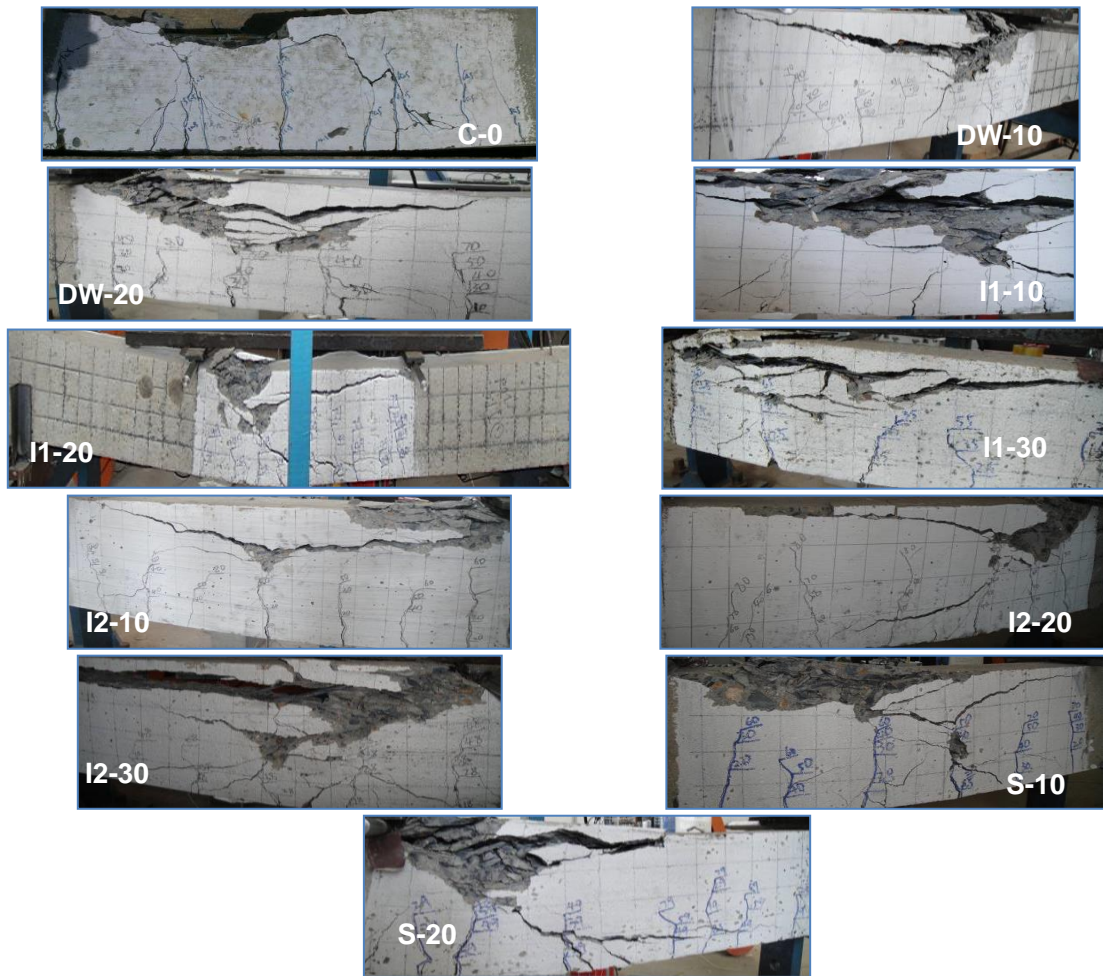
Failure modes of the reinforced concrete beams
